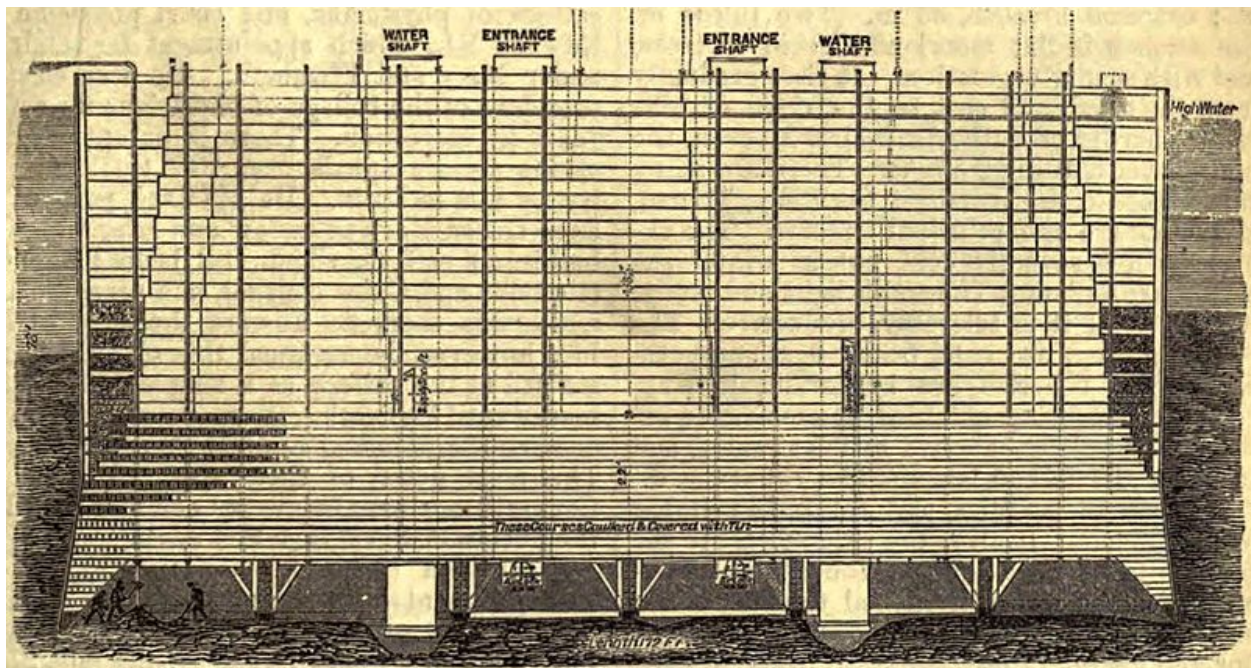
The New York caisson of the Brooklyn bridge foundation. (Wikimedia, 2014)
